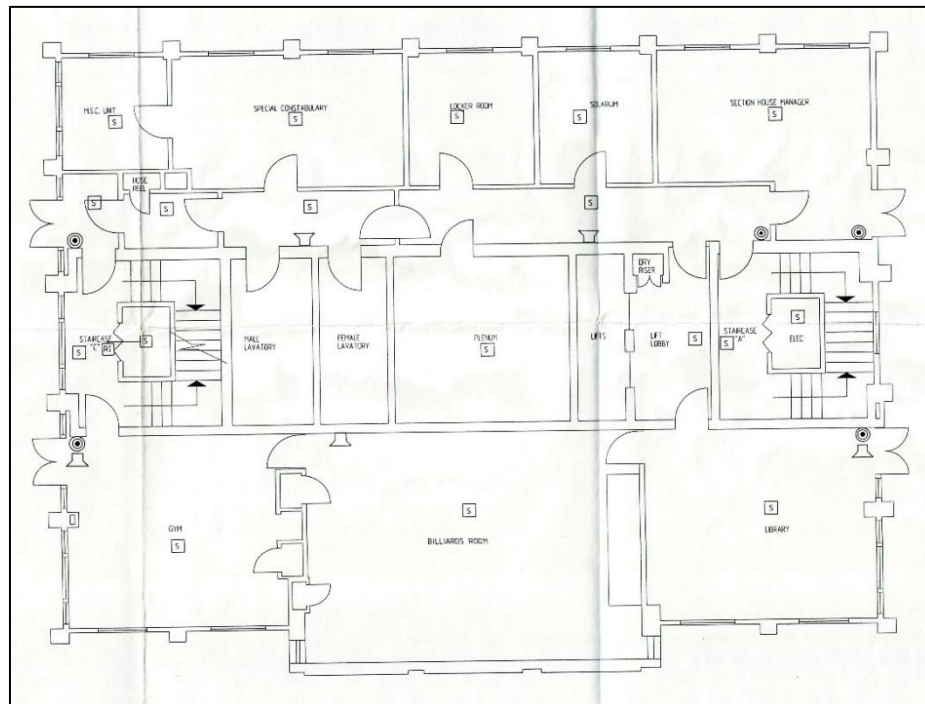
The 1994 fire alarm layout and plan of the third floor, section house tower, not to scale (J.E. Greatorrex and Partners)
